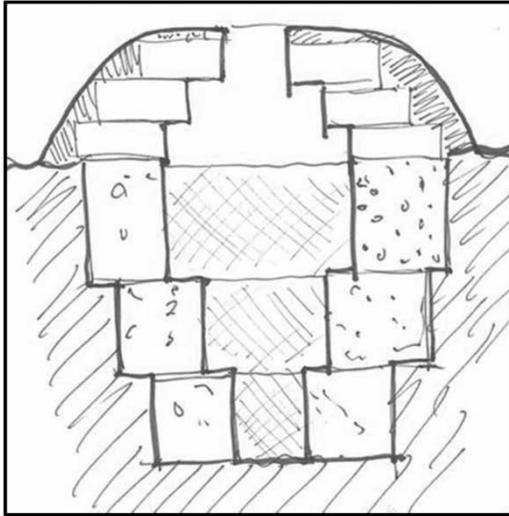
| Diagram of corbelled pit lining, flooring and slab.
